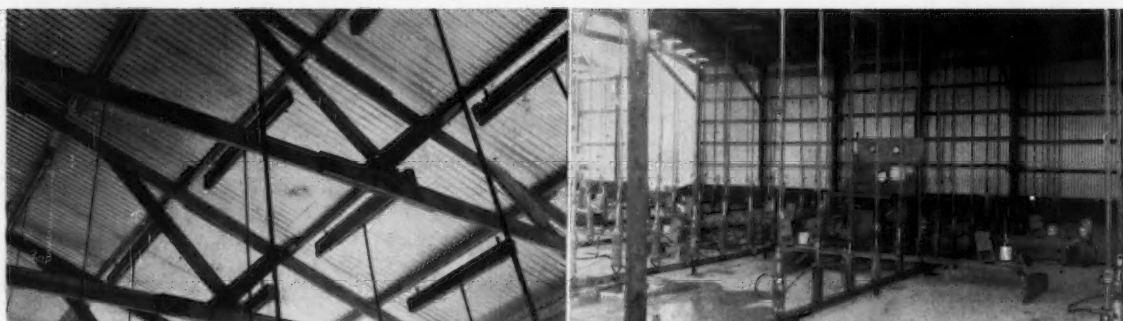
Simulated gravity loading: (Left) Experimental roof design showing loading attachments. (Right) Conventional roof design subjected to simulated gravity loading. (Note continuous deflection recorders located under each trussed rafter)
